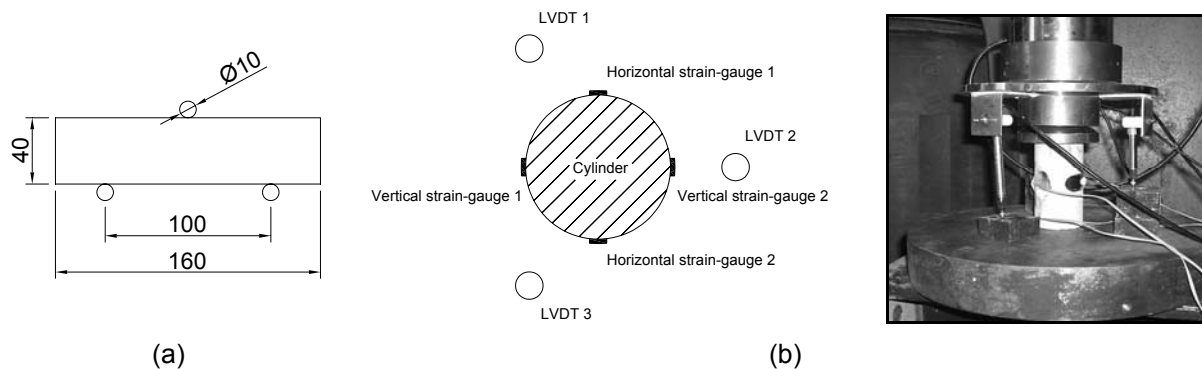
Details of the experimental tests in mortar: (a) compressive and flexural test in prismatic specimens and (b) compressive tests in cylinder specimens.
